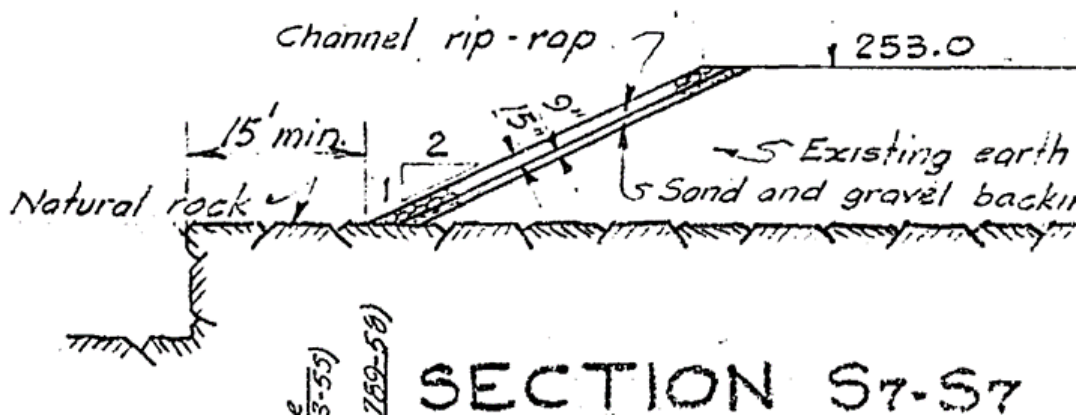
Typical cross-section of Intake Forebay/Channel North shoreline from historical drawing (NA21-FY-16-1_R06)
